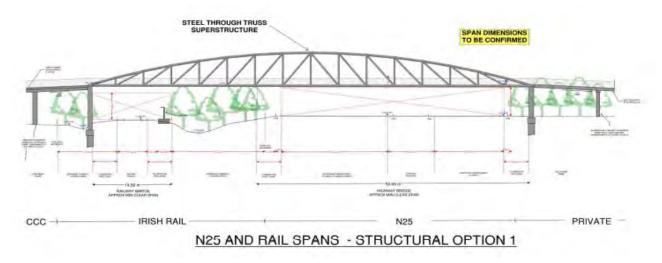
Structural option 1 indicative elevation with N25 span, Irish Rail span start of approach ramps
